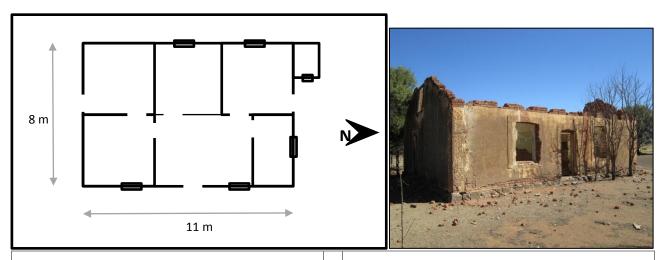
Floor plan of the historical farm house on Walkerville (point 126).
